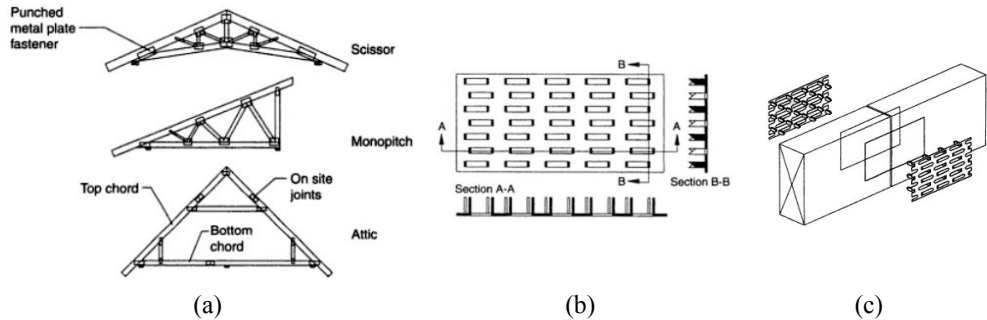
(a) Examples of light timber roof trusses made with punched metal plate fasteners, (b) Punched metal plate fasteners, (c) Splice joints with punched metal plate fasteners (Nielsen, 2003)
